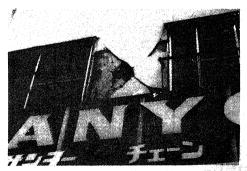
Crack of mortar finish on metal lathed steel structure (with ALC interior finish) (Shimoda)
